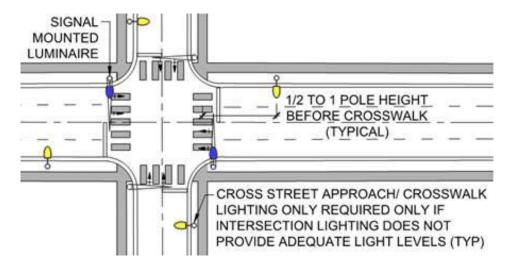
Typical Intersection Lighting Layout with Signals and Non-Continuous Lighting
